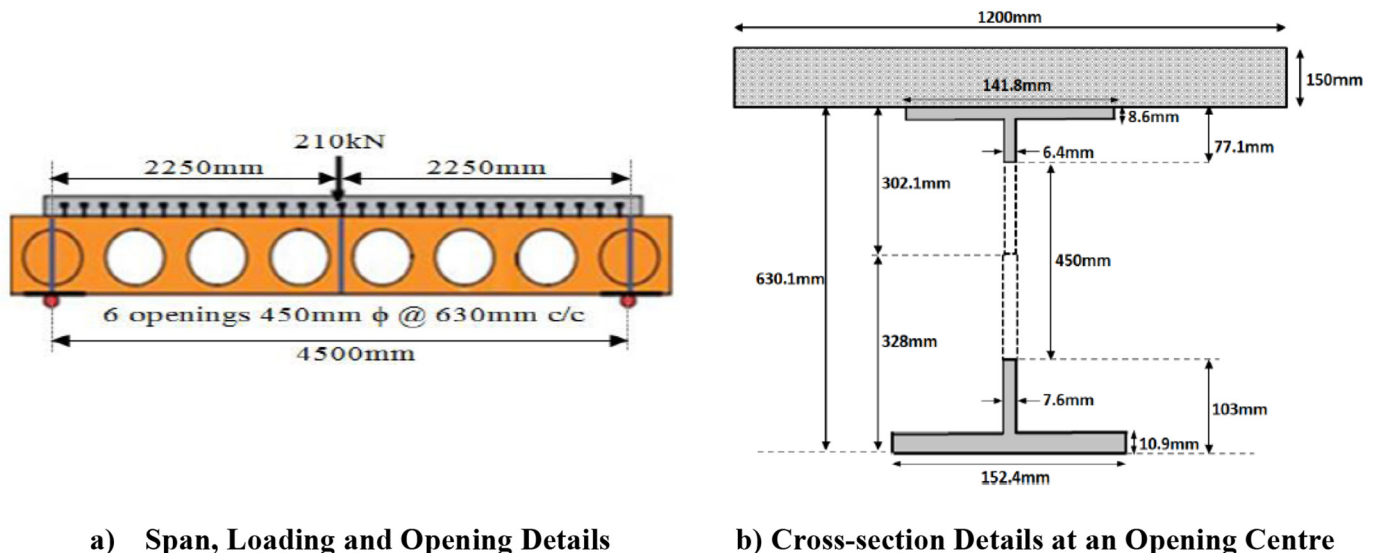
General arrangements and geometric details of test beam B of Nadjai et al. [10, 11].
